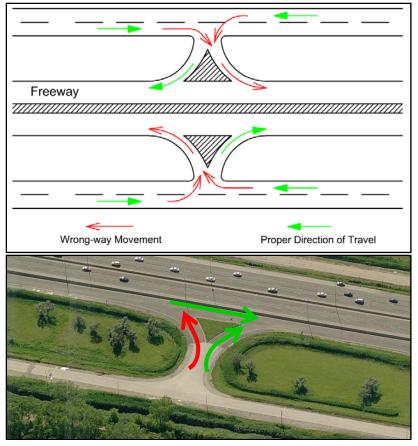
Button-hook ramp connected to parallel frontage road (Bottom image: Bing).
